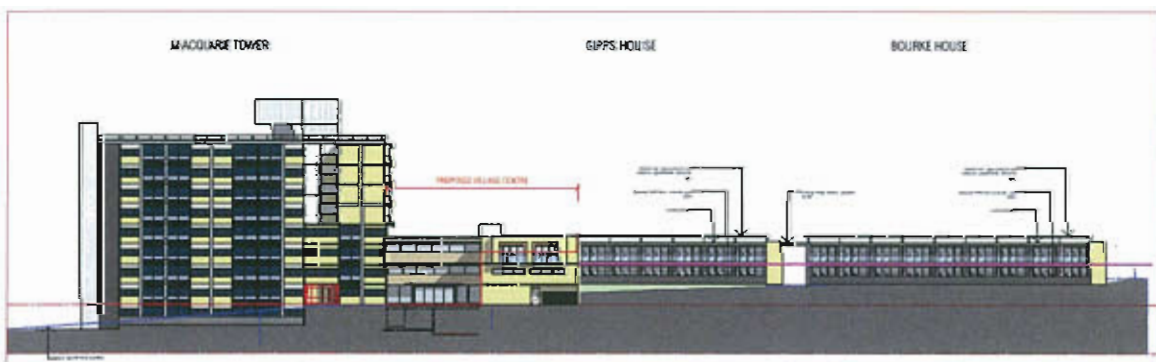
Proposed front elevation of the proposed development as viewed from Jersey Road
